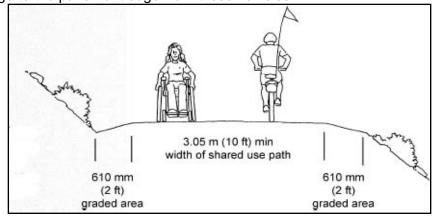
Typical Shared-use Path Standard Cross Section Source: FHWA
